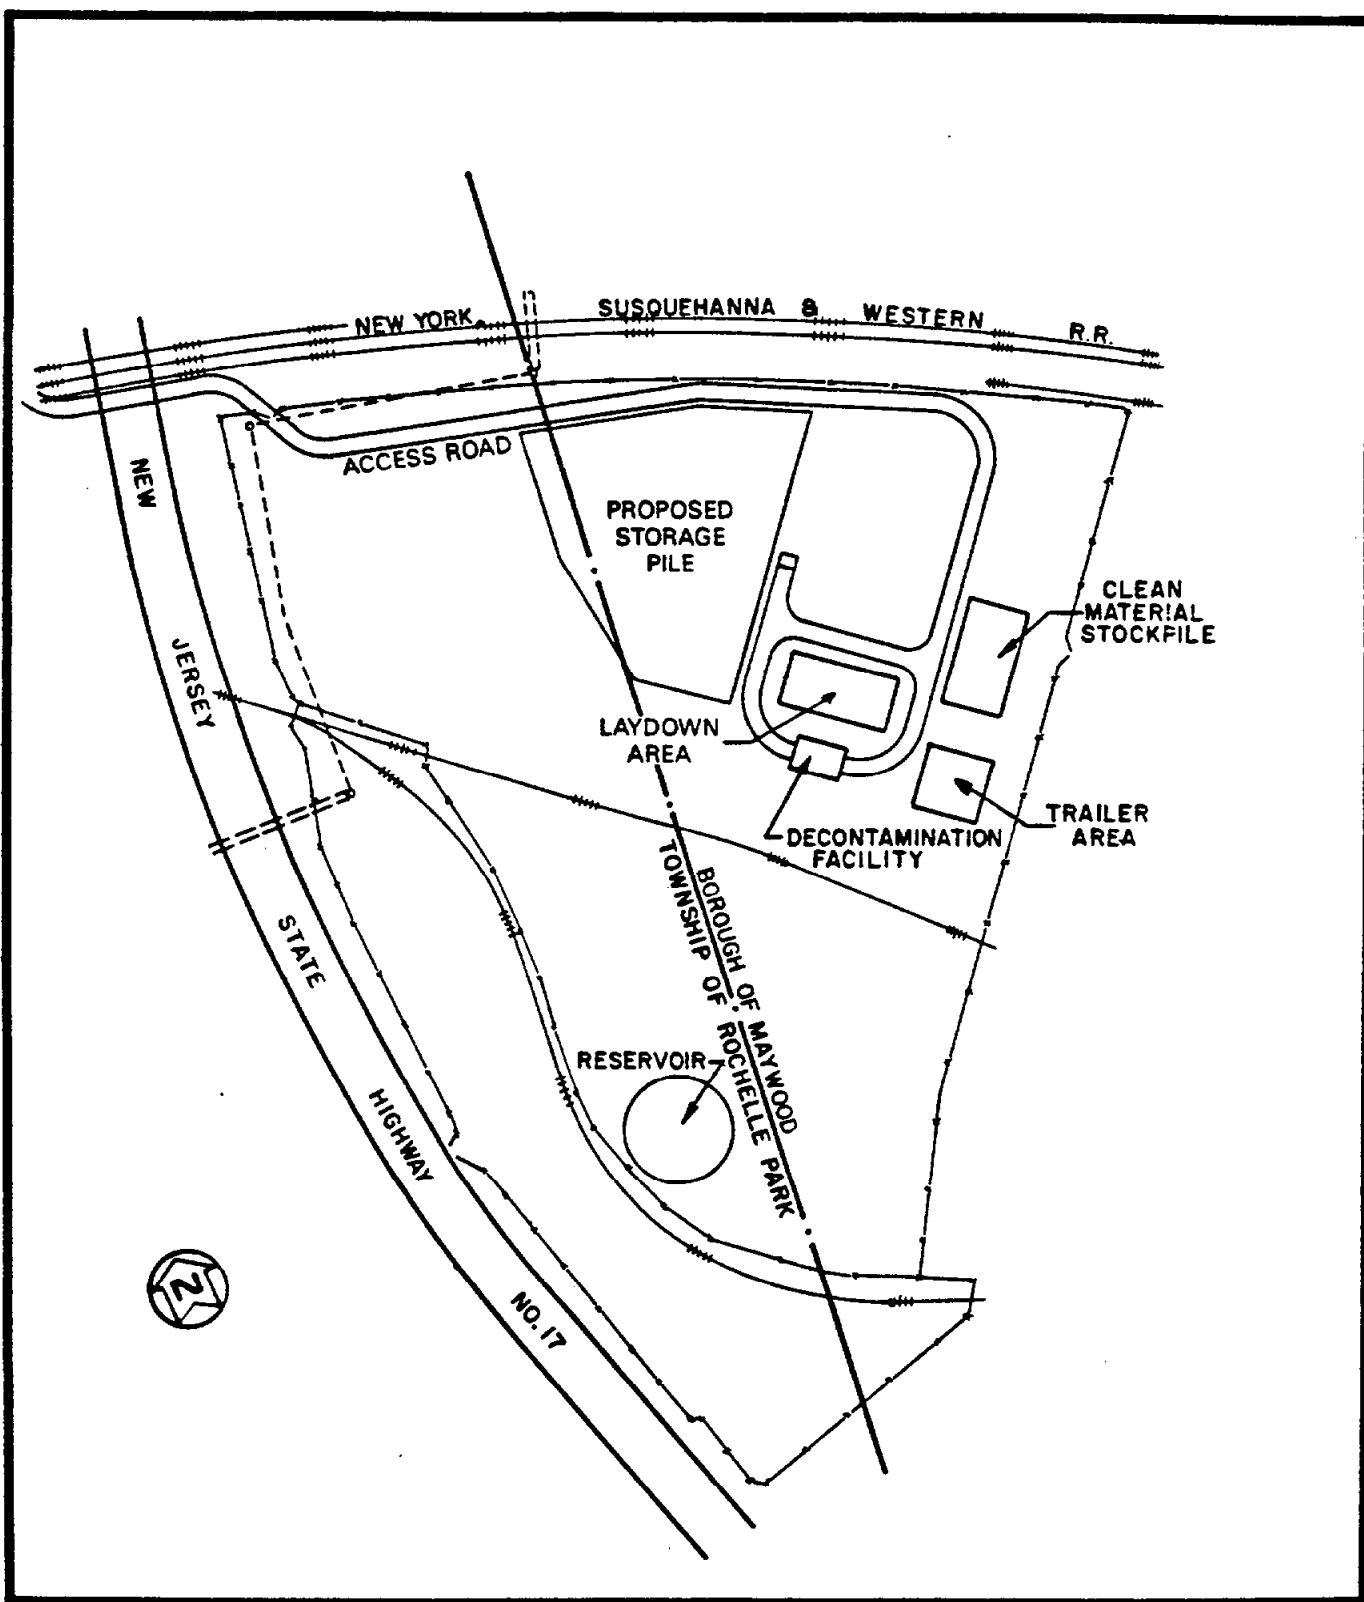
PROPOSED STORAGE PILE AT THE MISS
